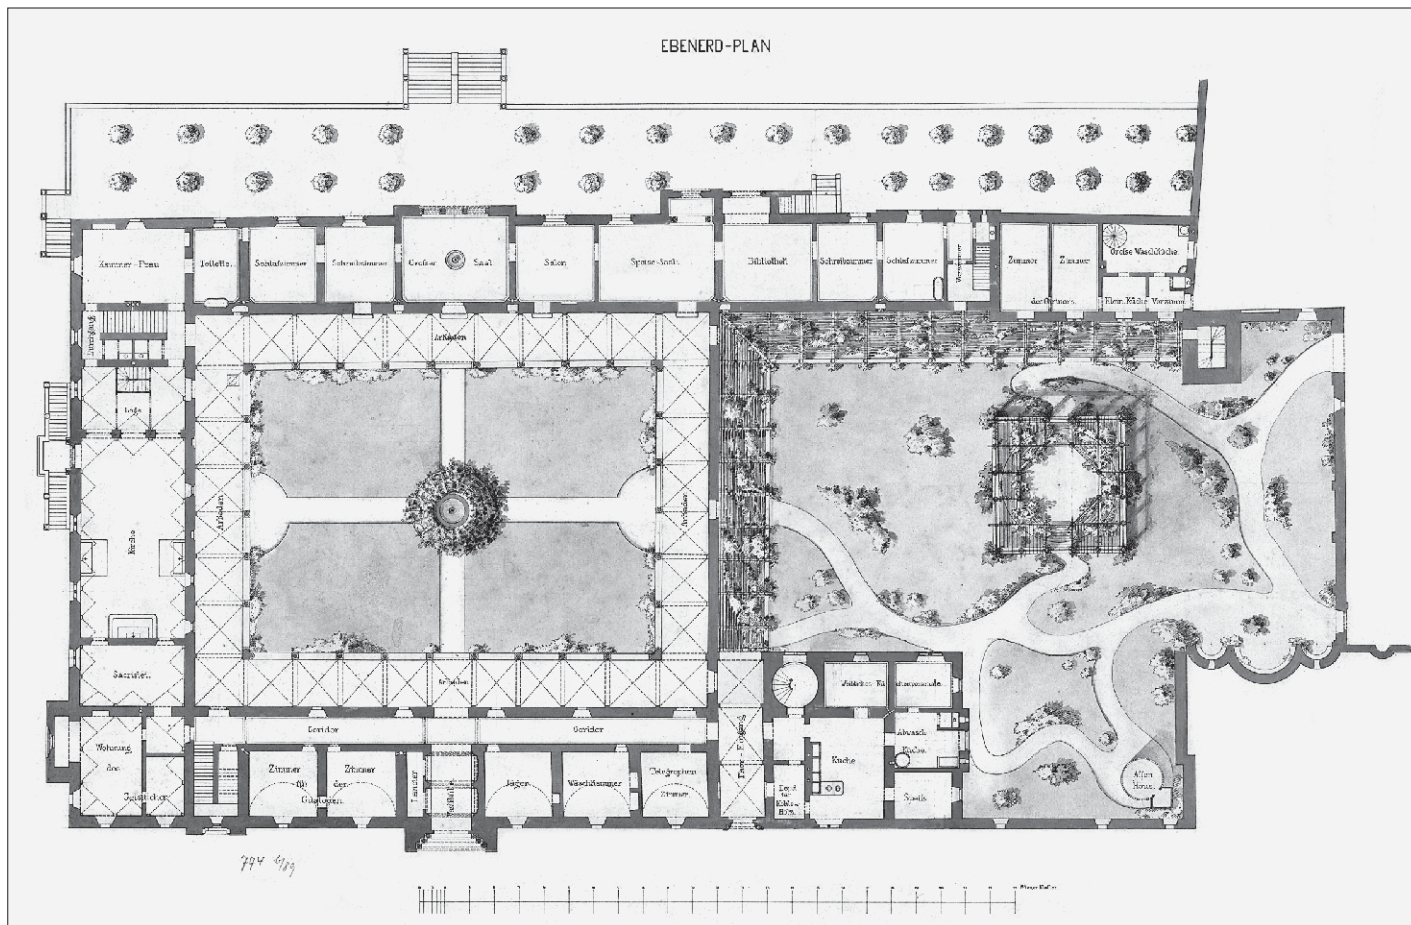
GROUND FLOOR PLAN, UNSIGNED, UNDATED
